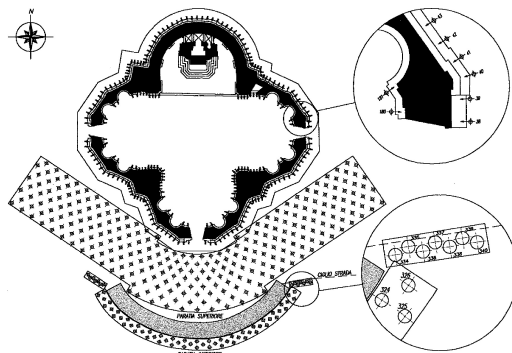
Planimetry of the operation on the upheaval. Bulkheads with large diameter piles and depth reinforcement with small diameter piles.
